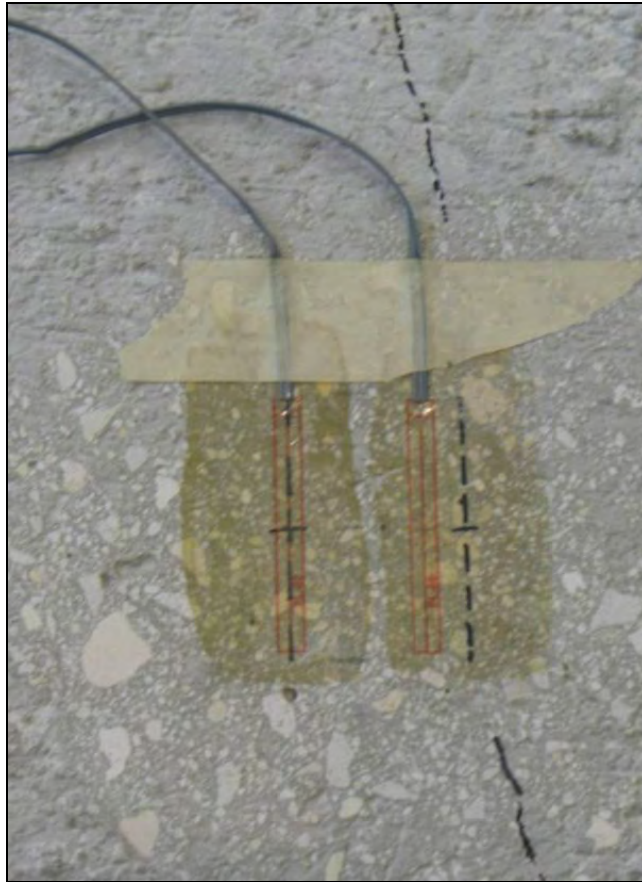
Concrete surface strain gages as applied to Specimen C1
